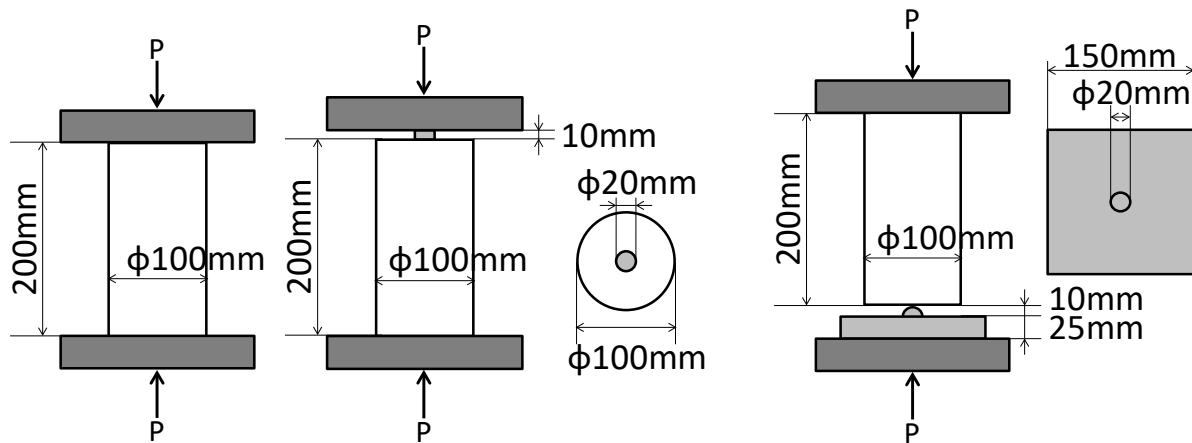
Loading method for the cylindrical specimen. (flat head loading, single-point flat and single-point hemispherical head loading)
